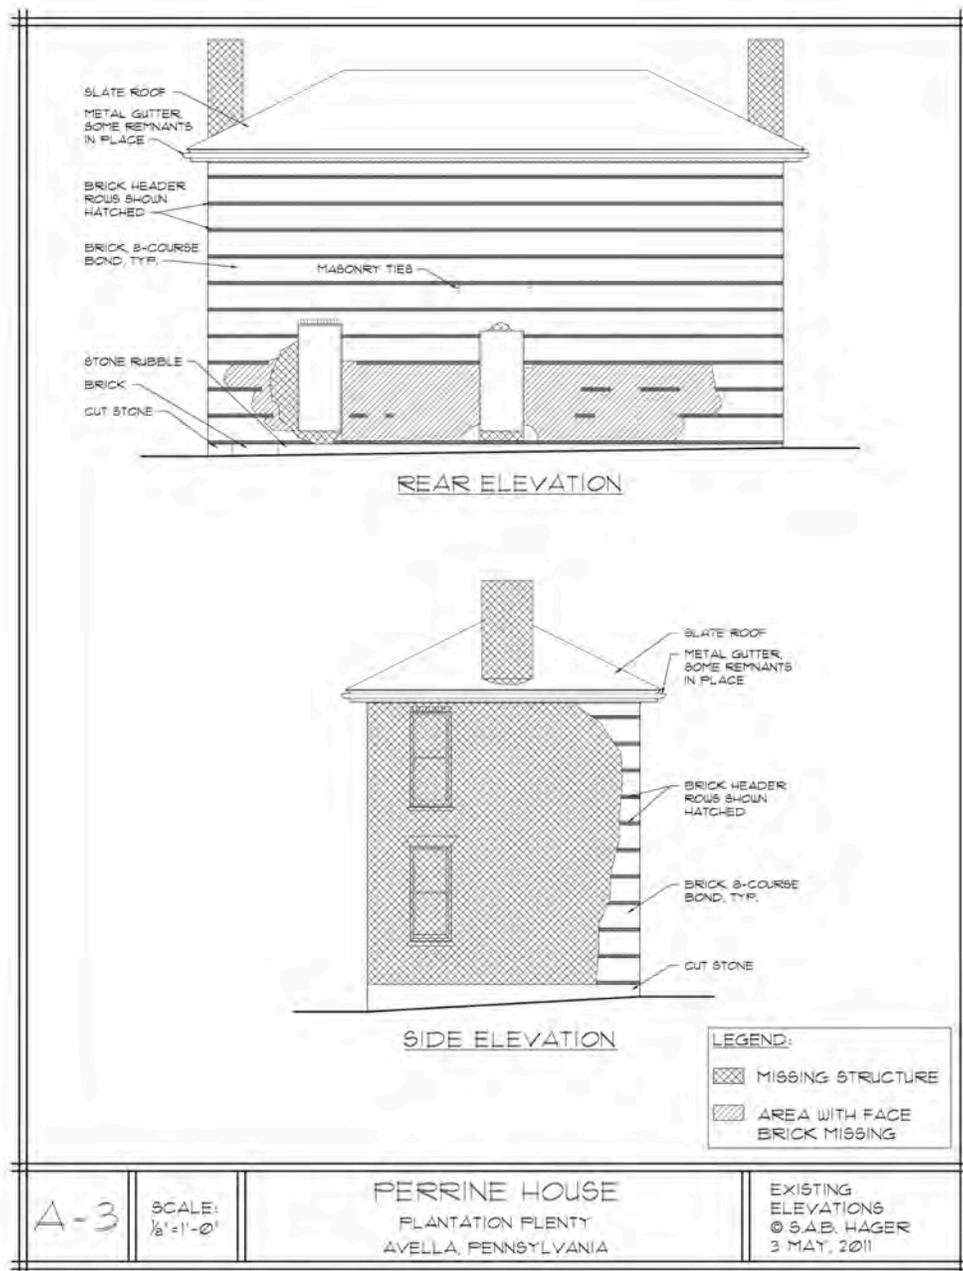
Plantation Plenty Perrin House Rear (northeast elevation) and Southeast side elevation
